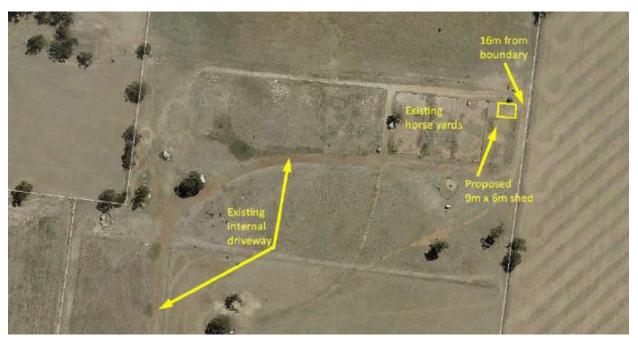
Site Plan prepared by North West Planning dated 20/08/2021.
